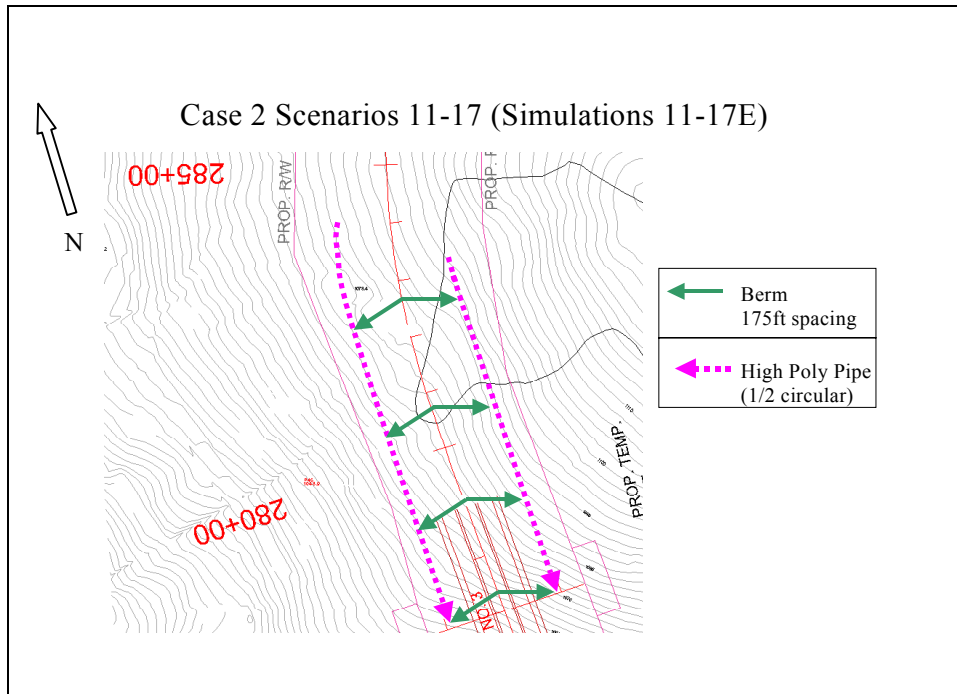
C- 10 Temporary earthen berms and down-drains in cut section.
